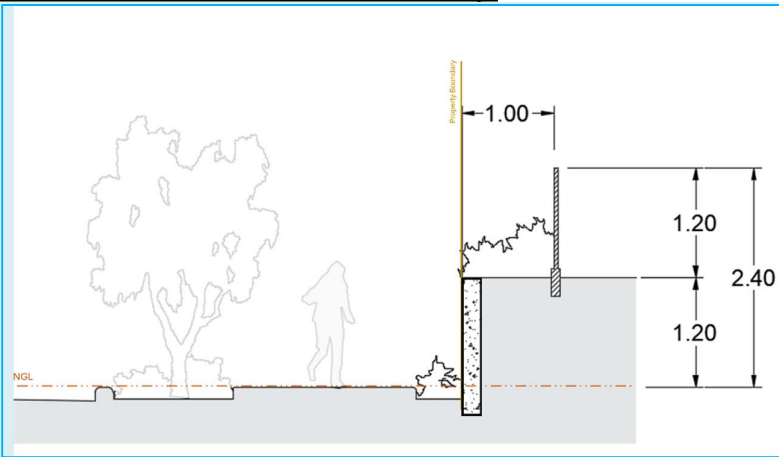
(di) Retaining wall and fence height - one step
